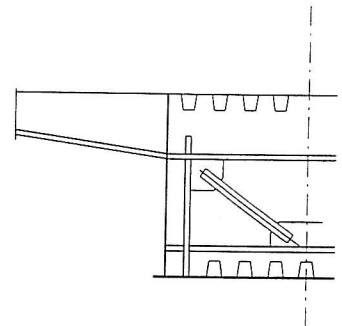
Reinforcement of the cross-section of an orthotropic box beam
